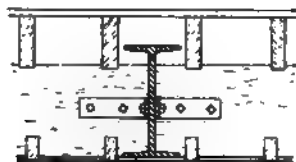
A Framed Floor with Wood Binders, and Steel Girder flush at the bottom.
